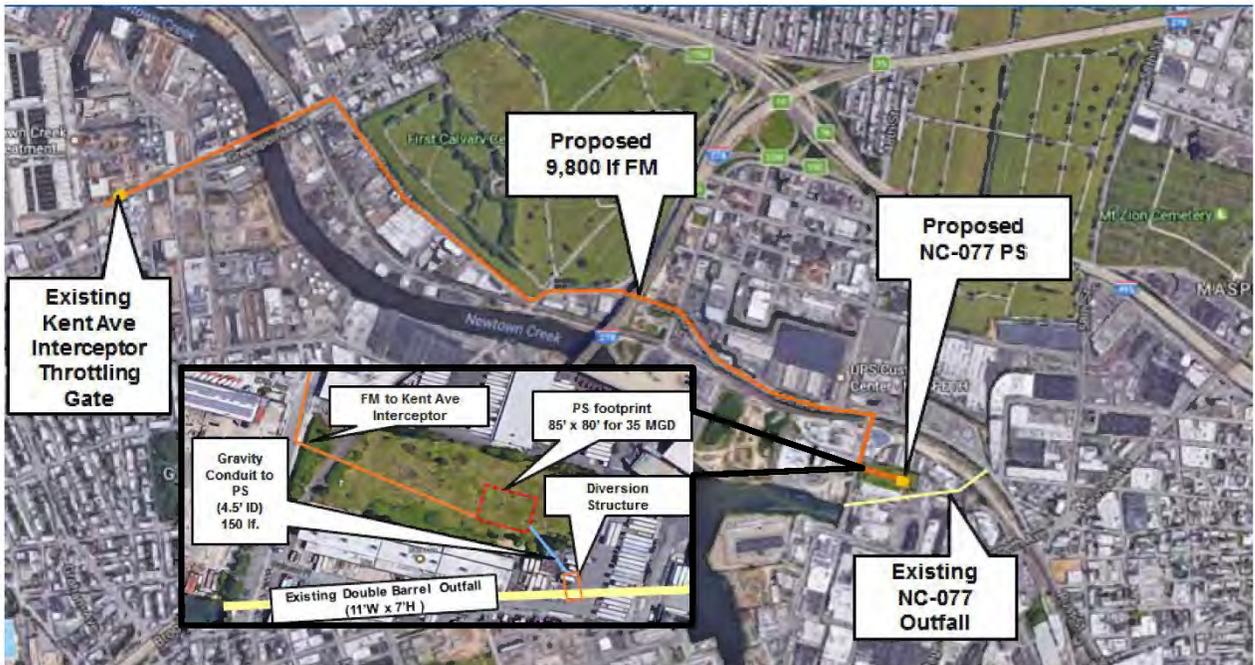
Layout of New Pumping Station at Outfall NC-077 part of Alternative CR-1
